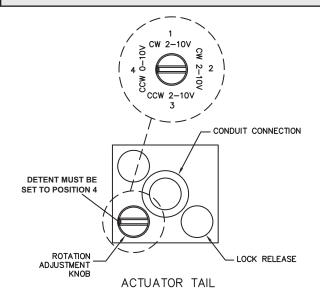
Elodrive Actuator — Rotation Knob Setting Set adjustment knob to Position 4
